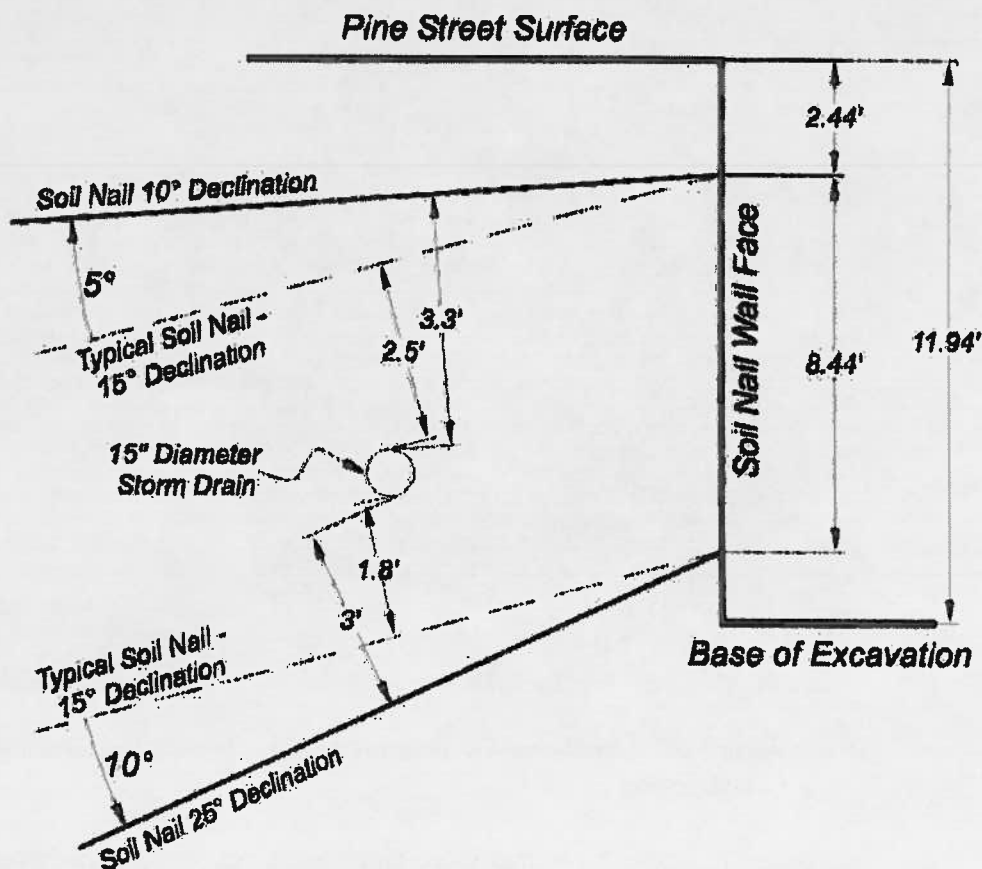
Typical Cross-Section Illustrating The Adjustments Performed On Soil Nails Extending Into Utility Alignments
